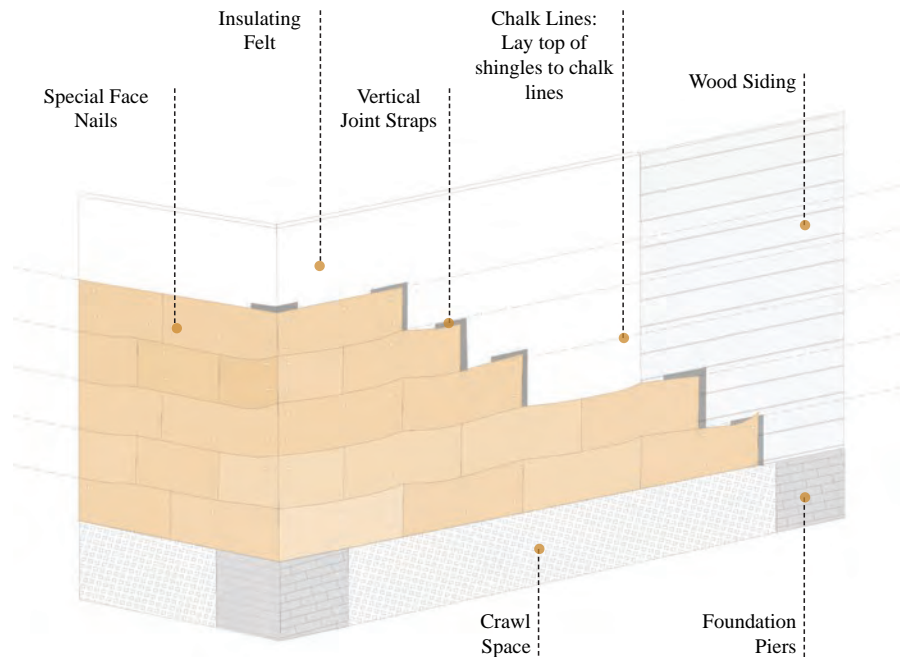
Asbestos-Cement Siding Installation Specifications (McCawley, 1940).
